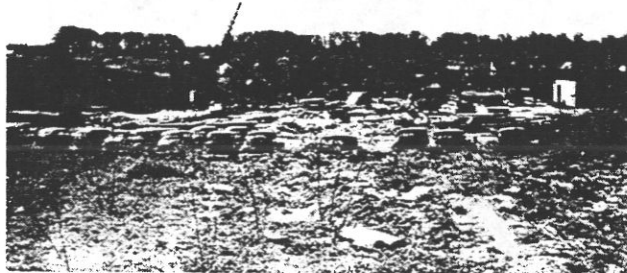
Corpsmen's Quarters, looking south. April 22, 1941.
